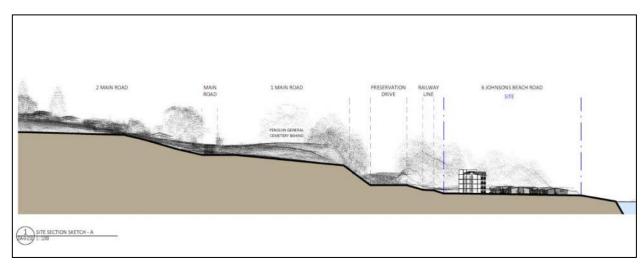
Section A - taken through the subject site and along the northern side of 1 Main Road.
